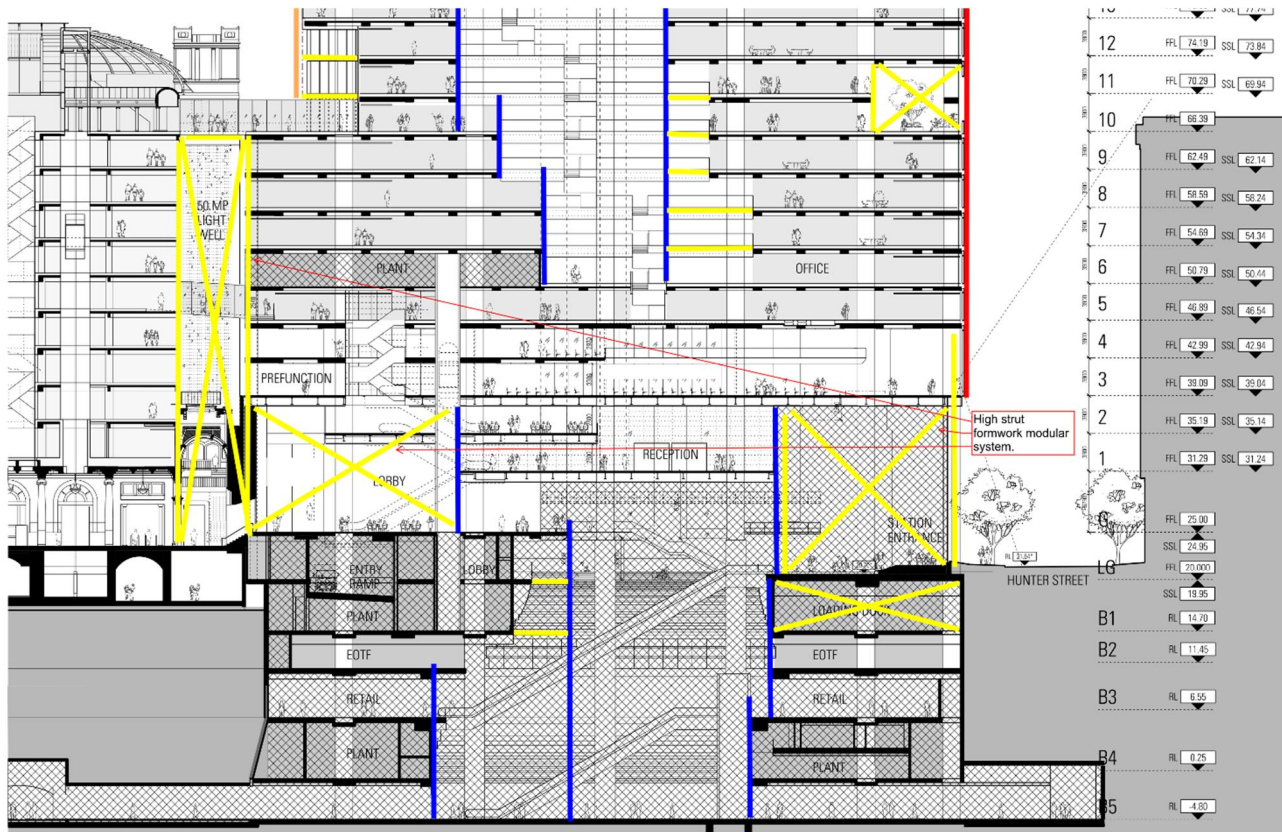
North Building Section - Illustrating the extent of High Strutting Formwork
